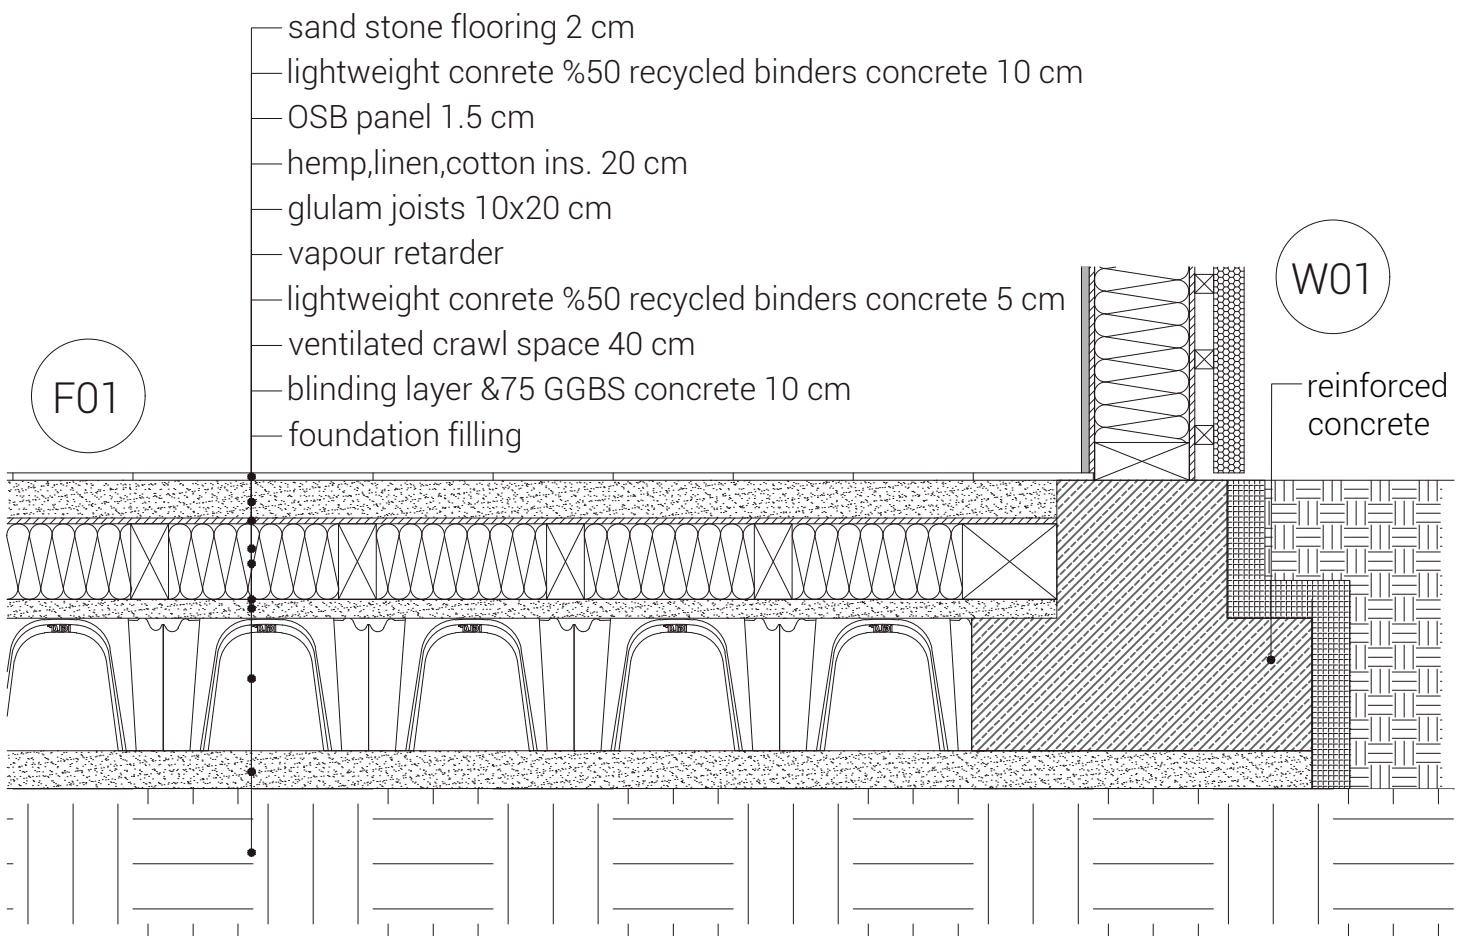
OPTIMIZATION FOUNDATION / GROUND FLOOR SLAB (F01)
